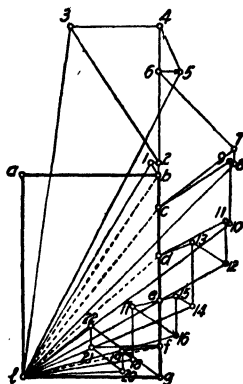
Dead load stress diagram—stresses in members of left half of arch.
